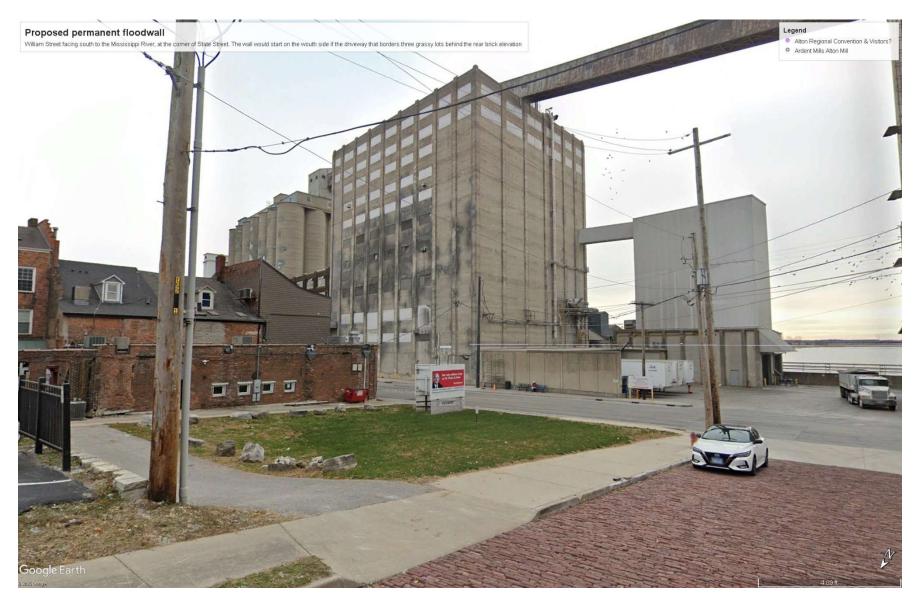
Location of Proposed Permanent Floodwall, corner of William Street and West Broadway; facing southeast
